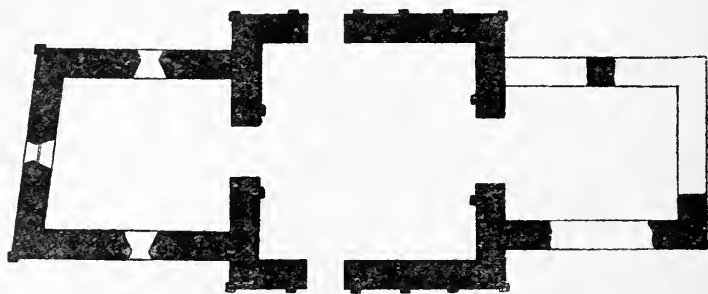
Plan of original Saxon church at Barton-on-Humber.
